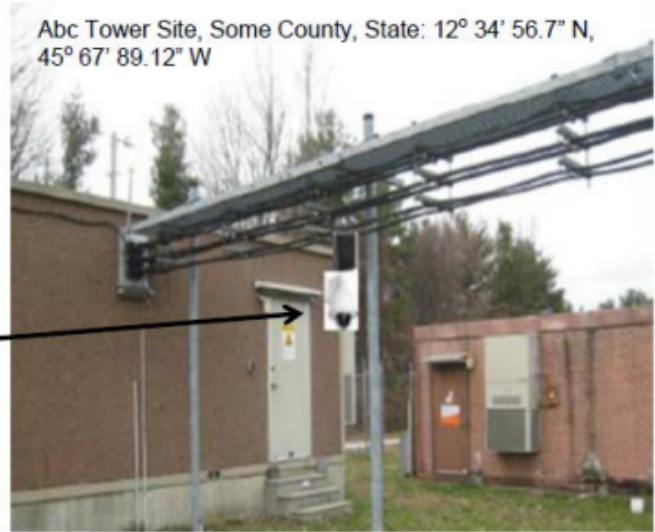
Ground-level photograph with graphic showing proposed equipment installation.
